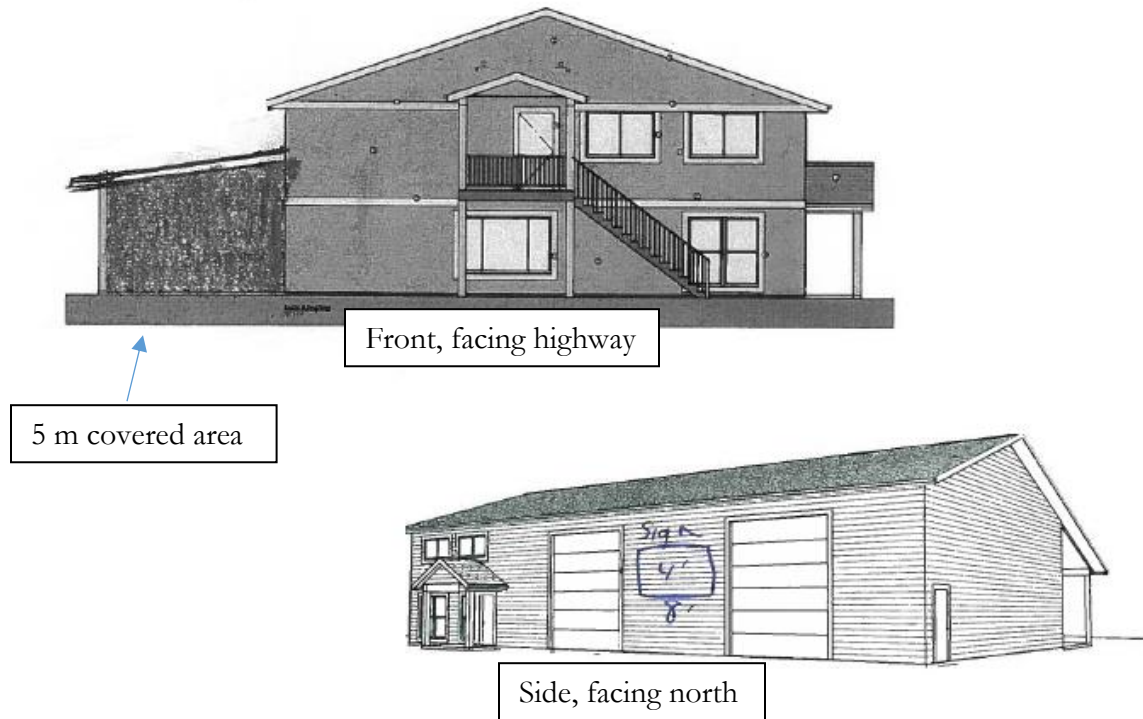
Elevation Drawings provided by Applicant of Proposed Building
